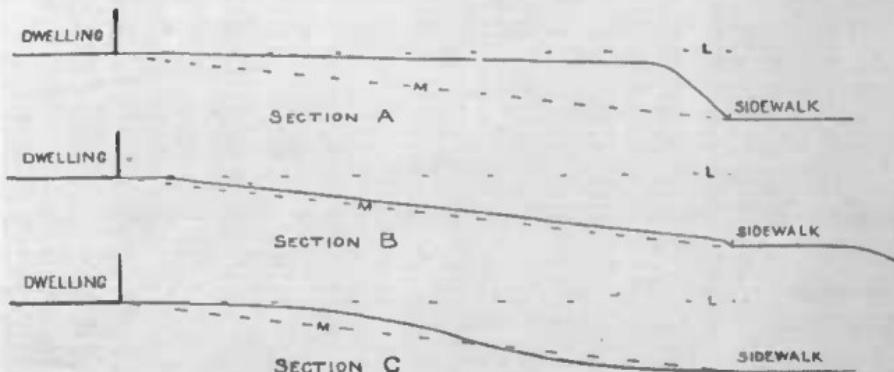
Cross sections of bad and good grading of small front yards. *L* indicates the level of the house foundation, and *M* a straight line from the top of the house foundation to the sidewalk level. *Section A:* Bad, with the rare exception of where a strictly formal treatment is admissible. *Section B:* Bad. *Section C:* Good. This ease curve may be short or long to accommodate the difference in height between the dwelling and sidewalk, and the distance between them.
